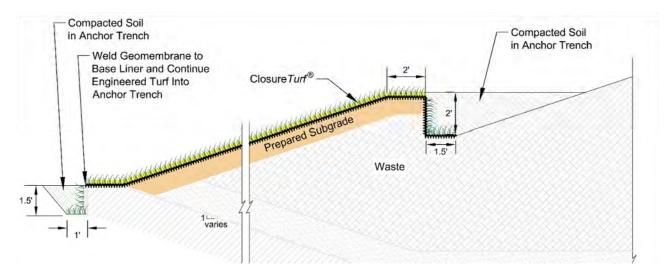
Typical ClosureTurf® Anchor Trenches at Top and Bottom of Slope
